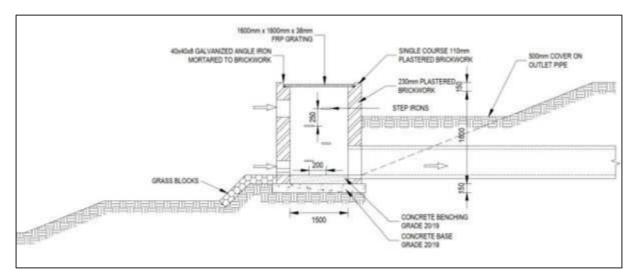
Wet Detention Pond – Typical Variable Outlet Structure
